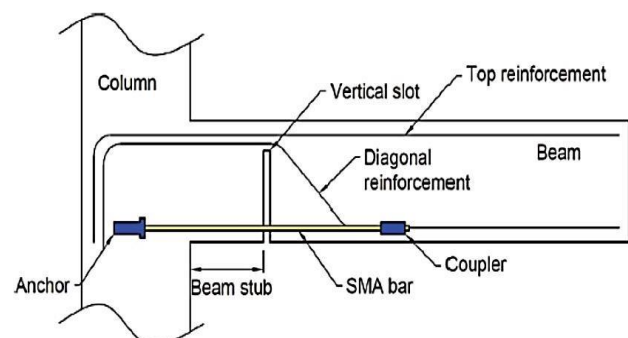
Schematics of the strengthening technique used for the beam-column joint with SMA rebars [32].
